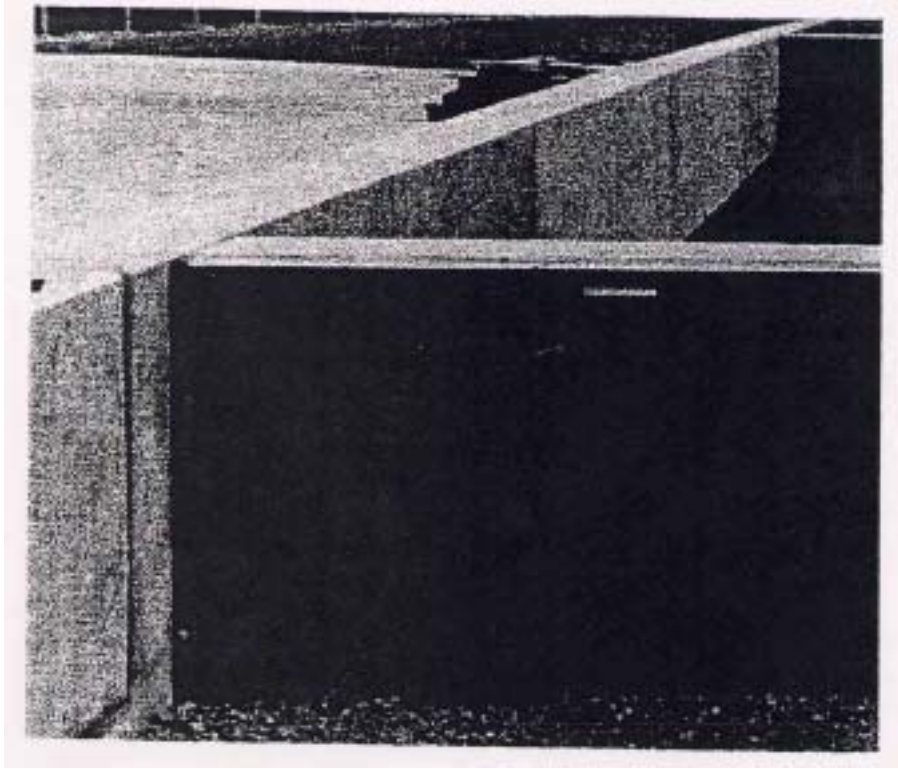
Conduits and Enclosure – North Main Street Westbound
